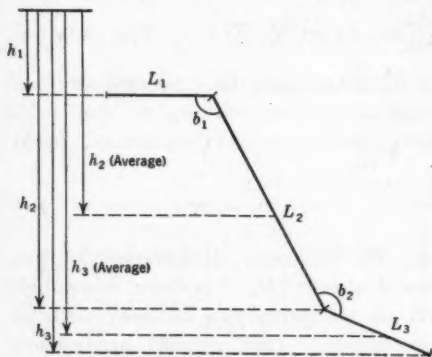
SCHEMATIC LAYOUT OF THE PENSTOCK
